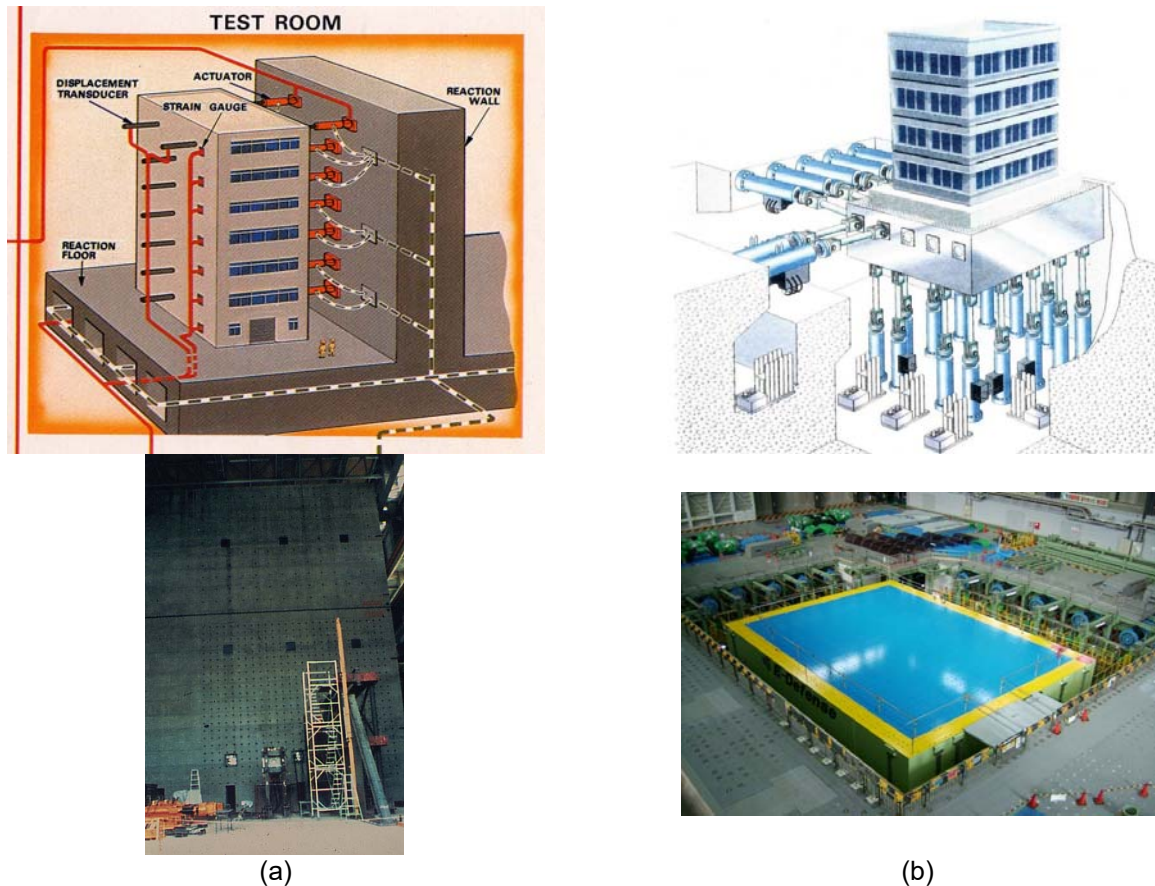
Large-scale testing facilities in Japan. (a) BRI's strong floor and wall (25m in length, 20 m in width, and 25 m in height) system (Okamoto et al., 1983); (b) E-Defense shaking table (20 m by 15 m in plan) (Nakashima et al., 2020).
